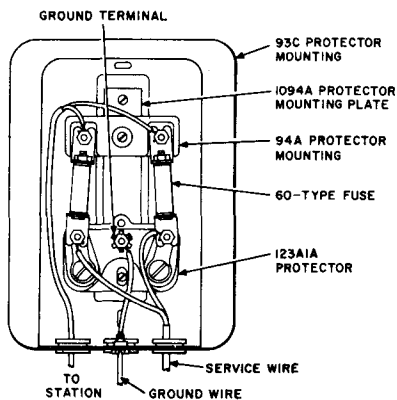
Fuseless Protector Equipped With 60-Type Fuses—Outdoor Installation
